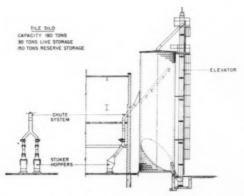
LAYOUT OF COAL-HANDLING EQUIPMENT
